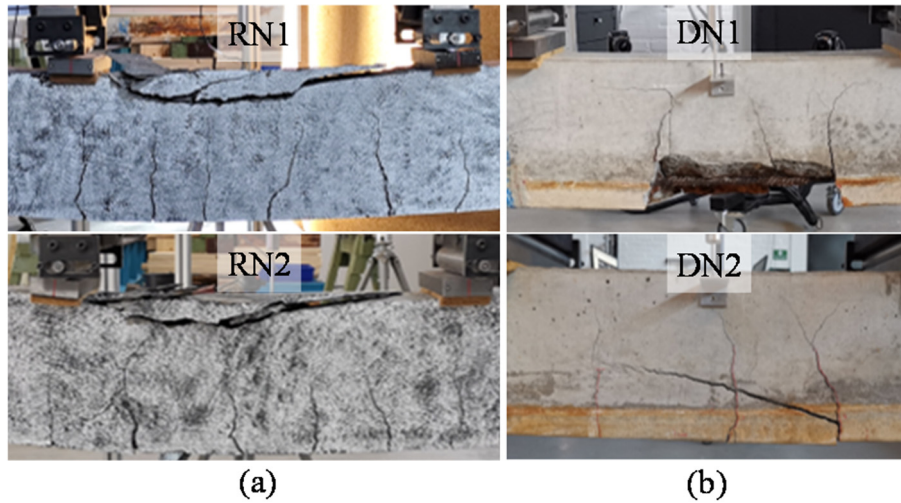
Flexural failure due to: (a) concrete crushing in the reference beams RN1 and RN2 and (b) rupture of corroded tensile reinforcement bars, accompanied by concrete cover spalling off in DN 1 and concrete cover delamination in DN2.
